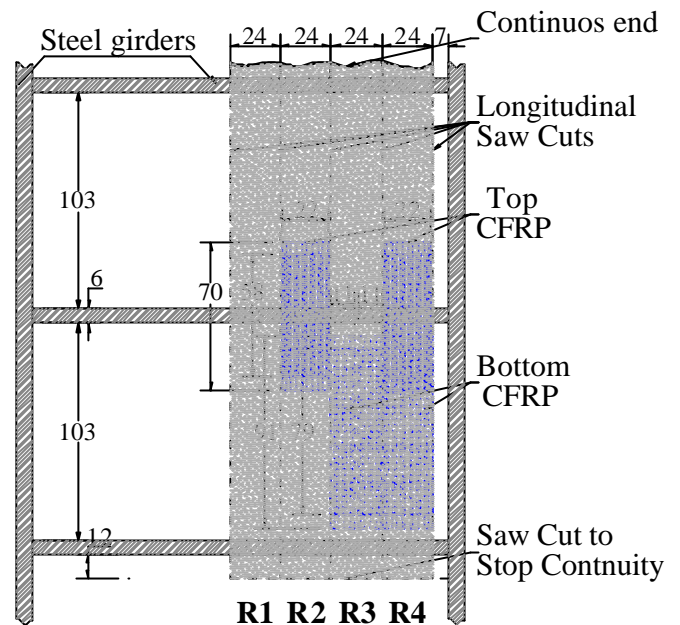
Geometry and Detail of Strengthening (US units; 1 in = 2.54 cm)
